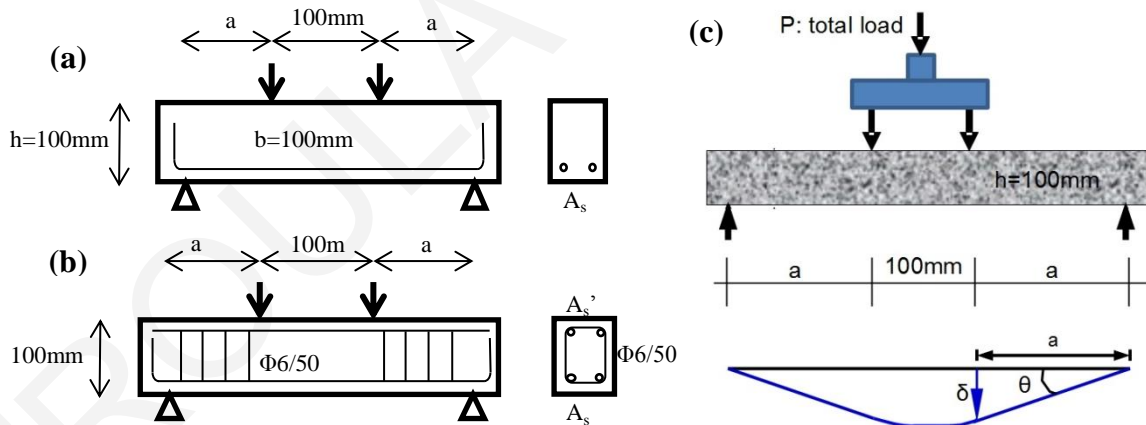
Test configuration for four point bending and reinforcement details for a) beams with flexural reinforcement and b) beams reinforced with longitudinal bars in the compressive and tensile region and stirrups to eliminate shear failure, c) definition of specimen rotation  $\theta$  in the shear span (reference to rotation capacity)
